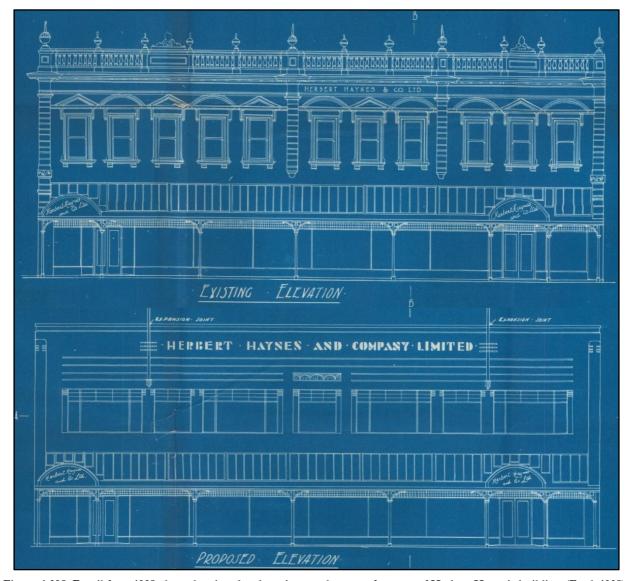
Detail from 1935 plans showing the alterations to the street frontage of Herbert Hayne's building (Ford, 1935).
